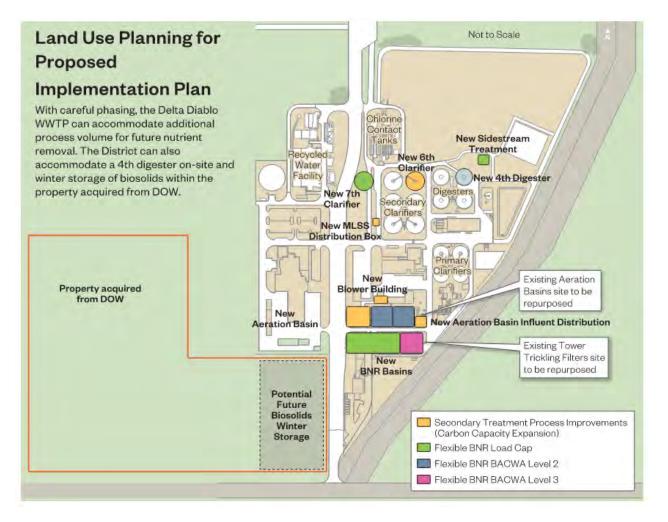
Site Planning for Implementation Plan from 2022 Master Plan
